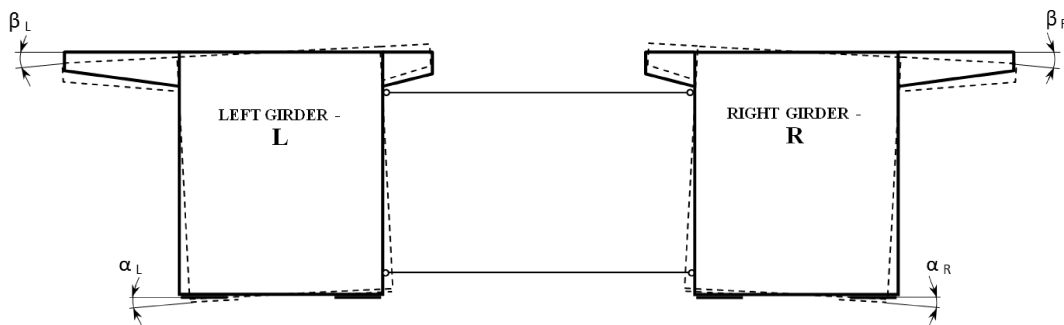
Scheme of deformation of cross-sections of the bridge girders in the measurement plane
